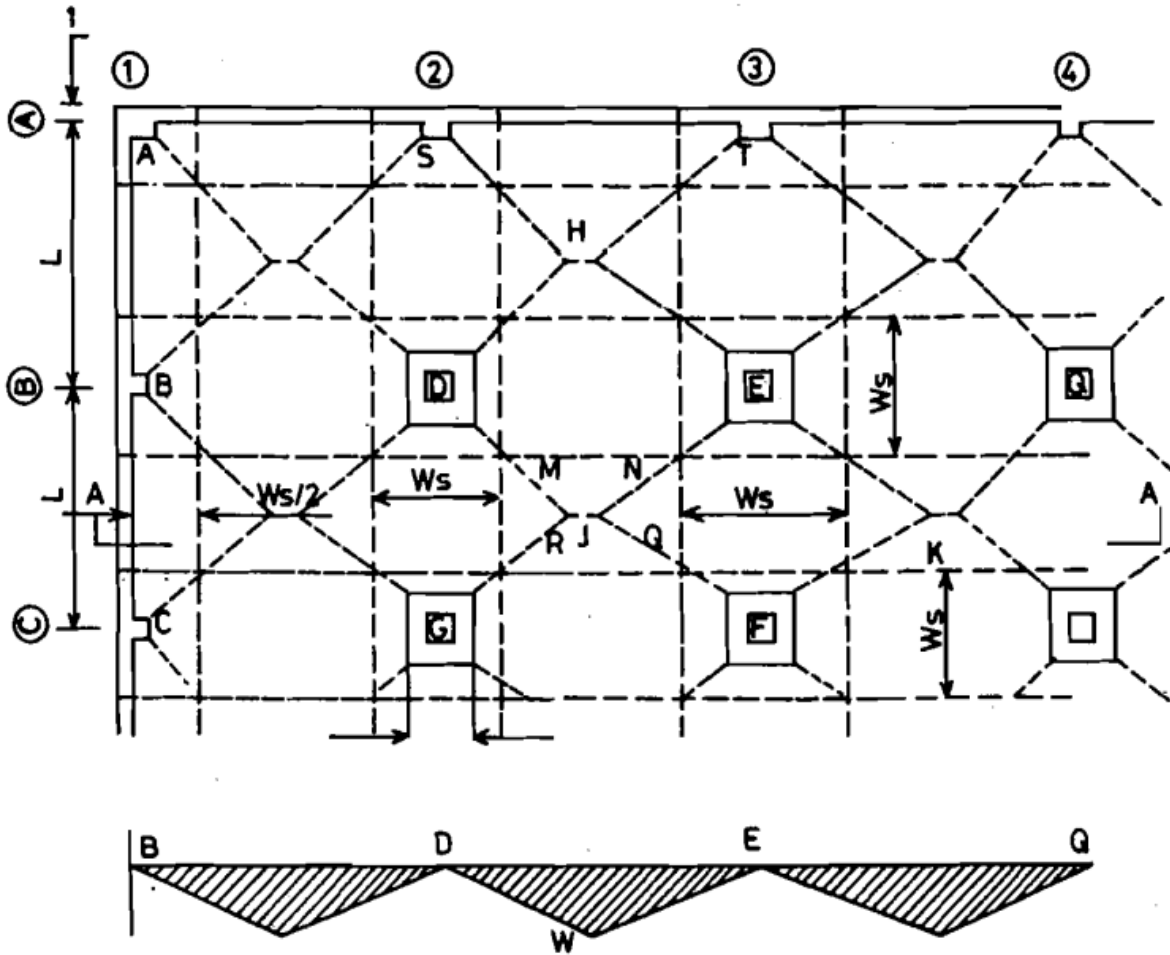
PLAN OF ASSUMED COLUMNS STRIPS AND LOADS DISTRIBUTION BY DUNCAN [3]
